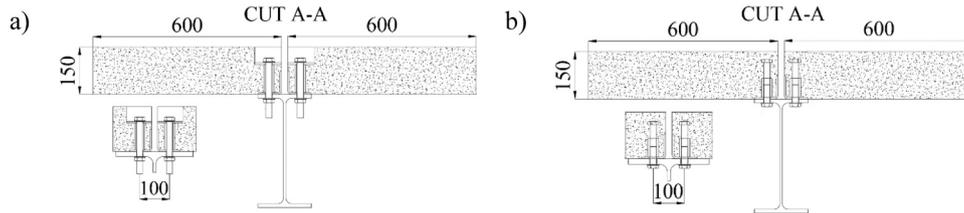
Cross-section of composite beams for the room temperature tests: a) FIREDUCE-RT-P3; b) FIREDUCE-RT-P15 (dimensions in mm).
